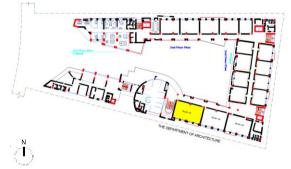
2nd floor Plan of AUST showing location of case studio (shaded).
